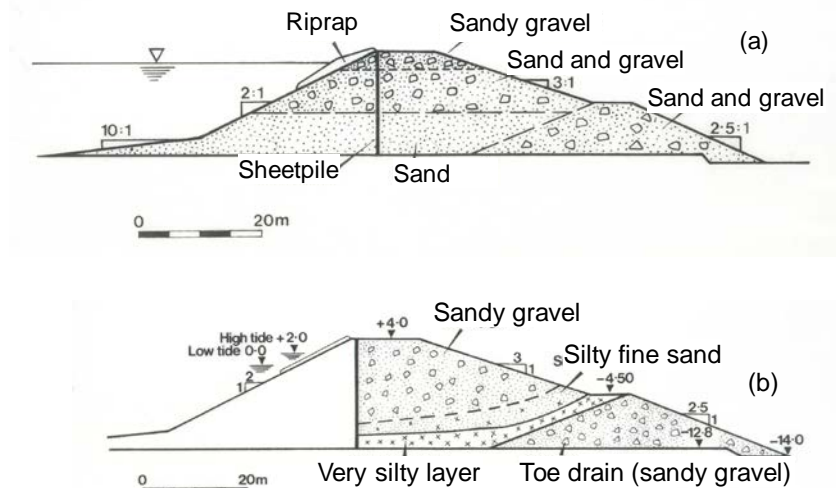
Dubai Dry Dock – earth cofferdam (a) intended section (b) as built
